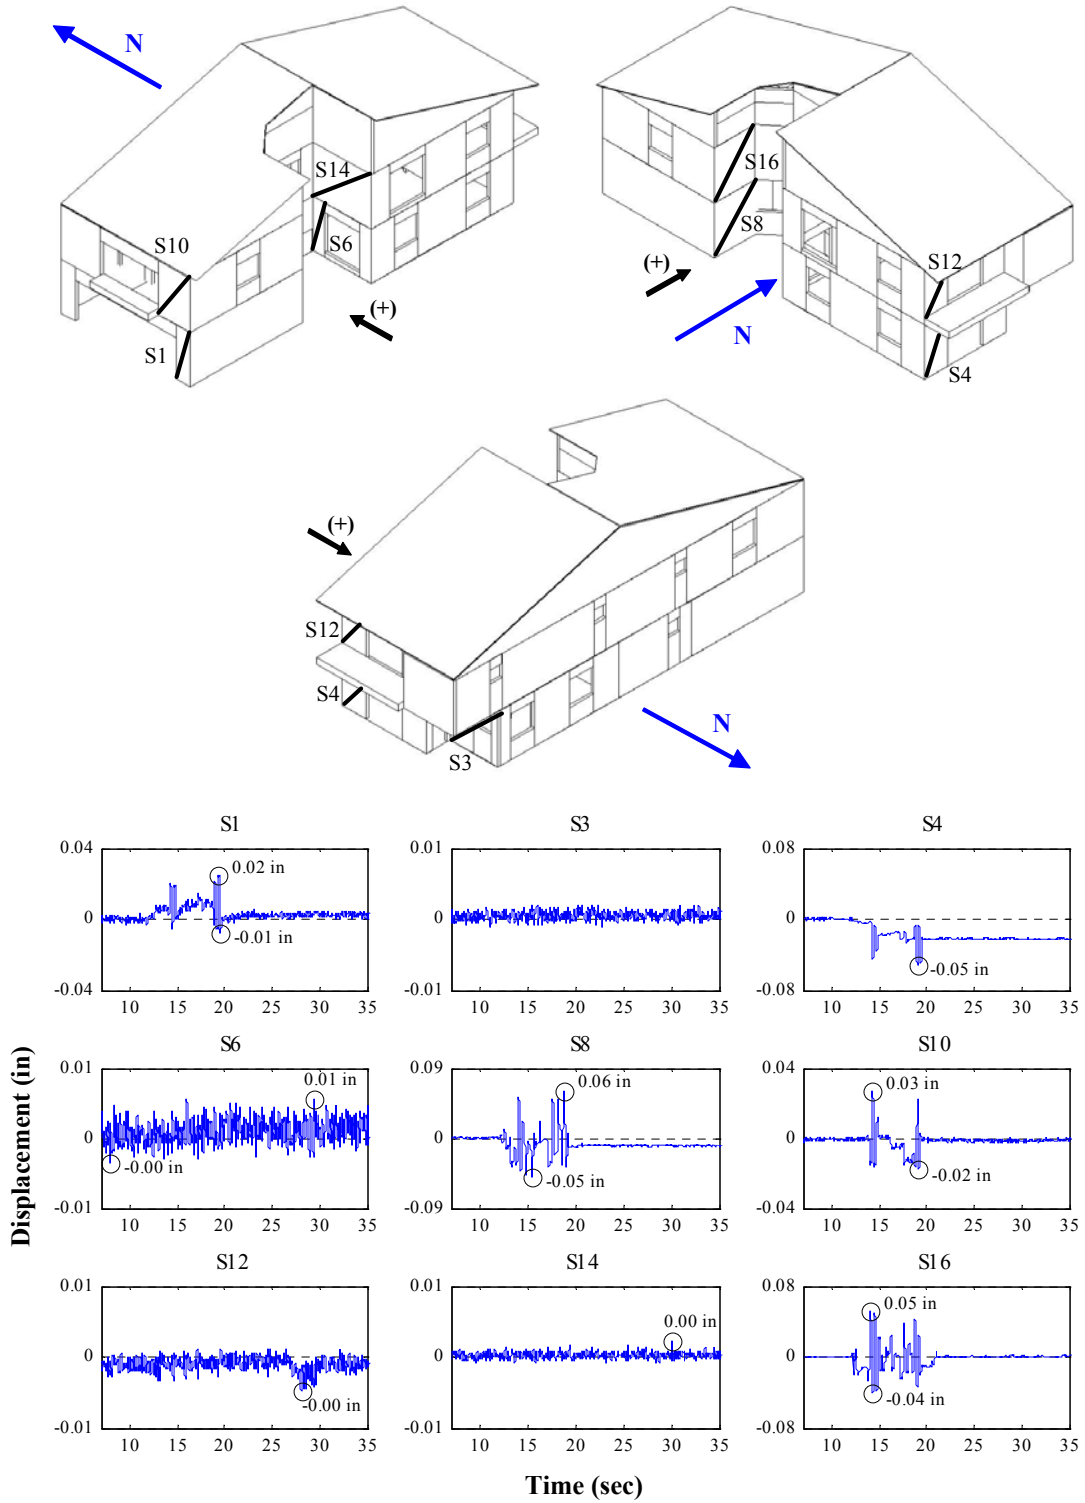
Wall deformations of north-south external walls for Test NWP2S12
